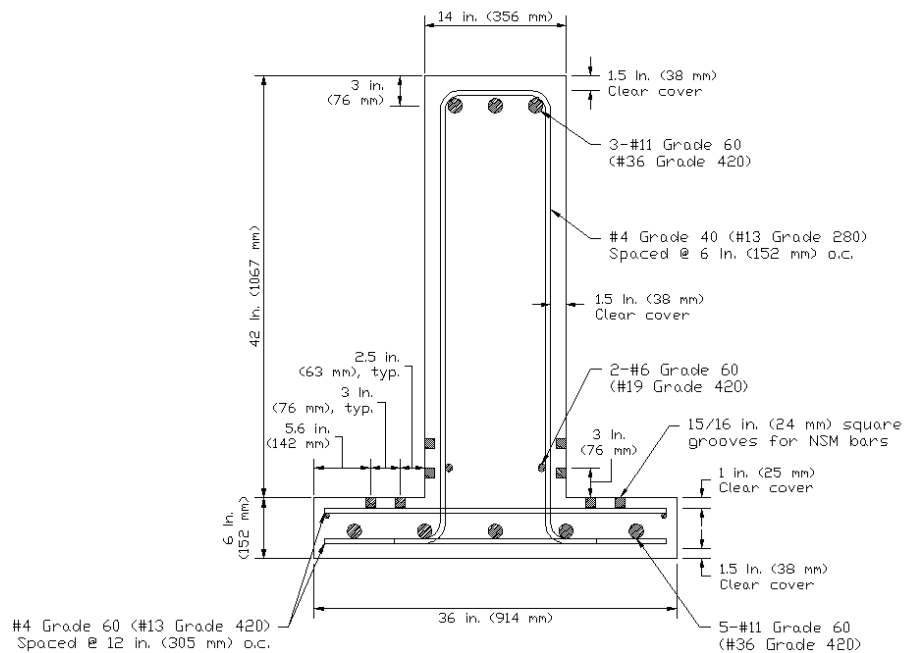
Specimen IT.45.Ld3(6).SS cross-section
